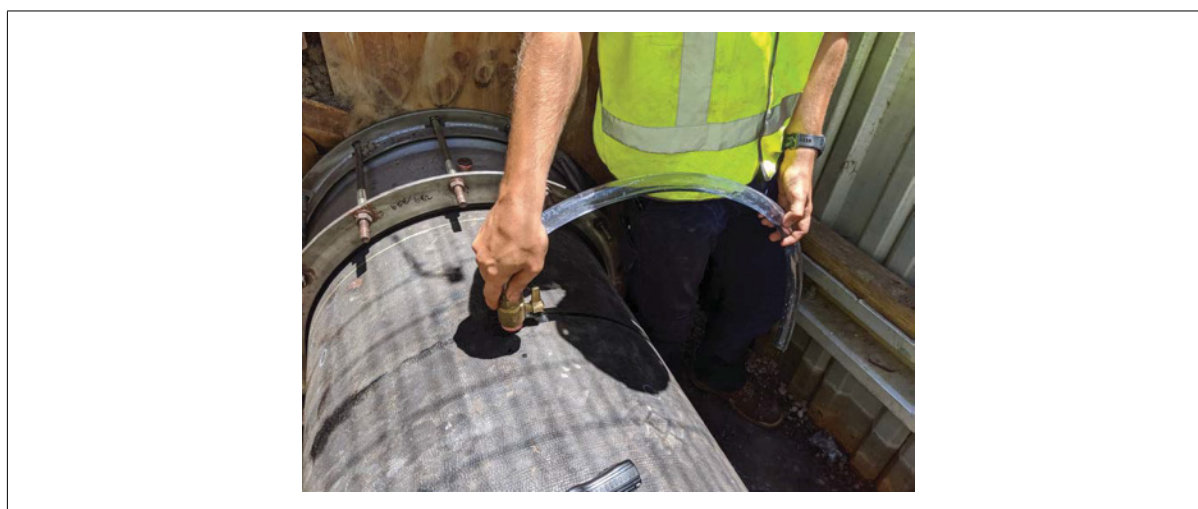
Flexible tubing used to redirect flow from the top leak point onto the floor of the pit.
